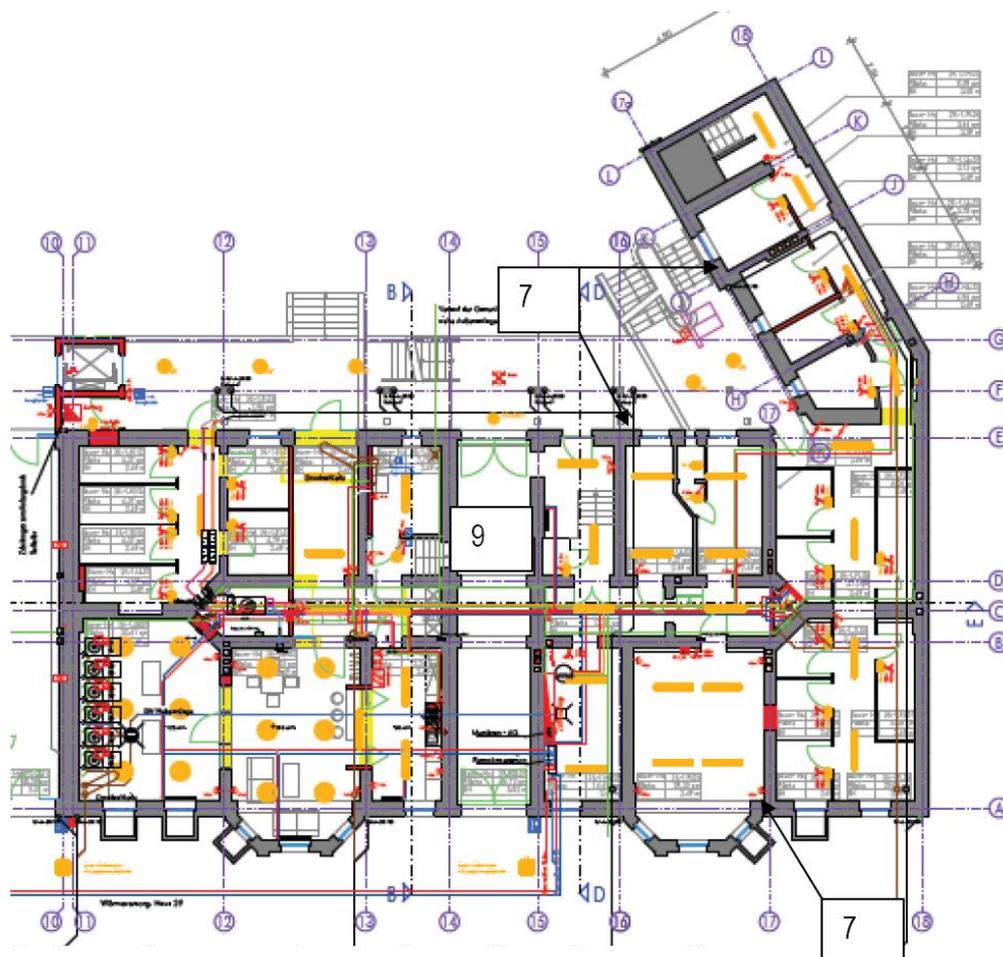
Cellar floor plan (Source of Figures 13-15: Dr. Monika Weineck, engineer)
